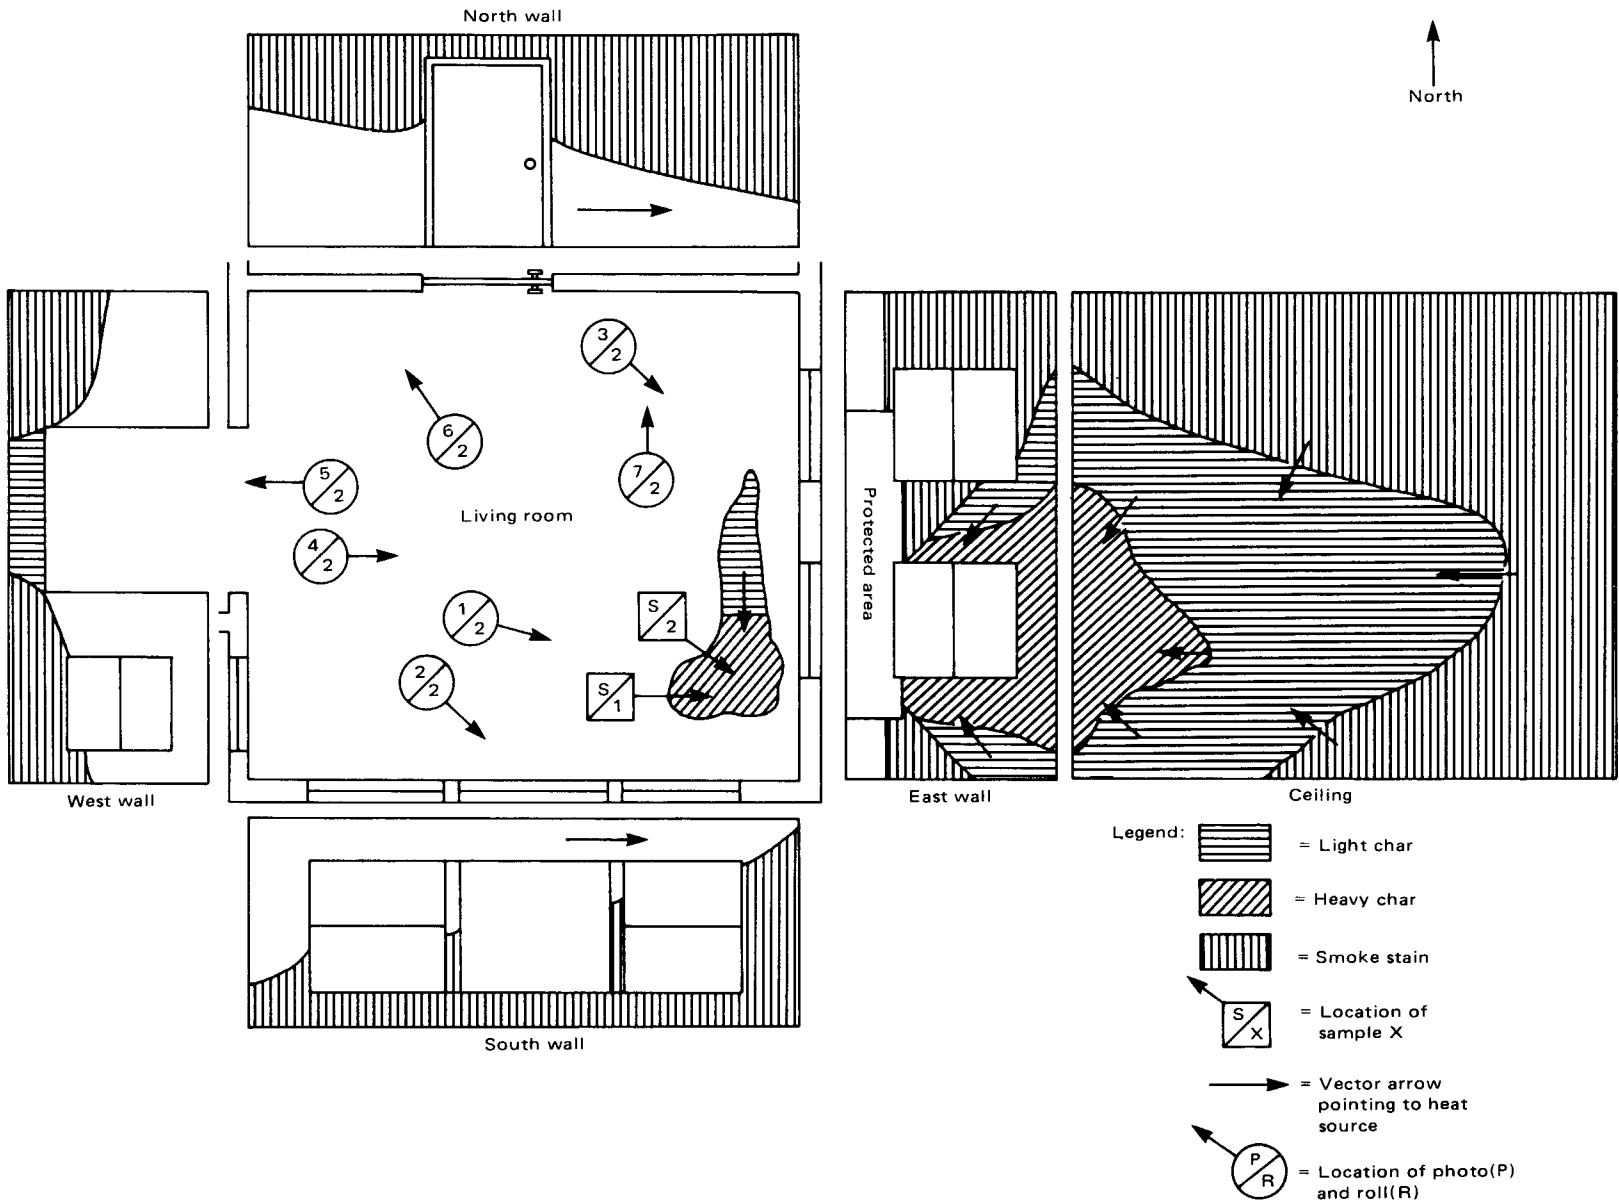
(d) Exploded room diagram showing damage patterns, sample locations, and photo locations.
